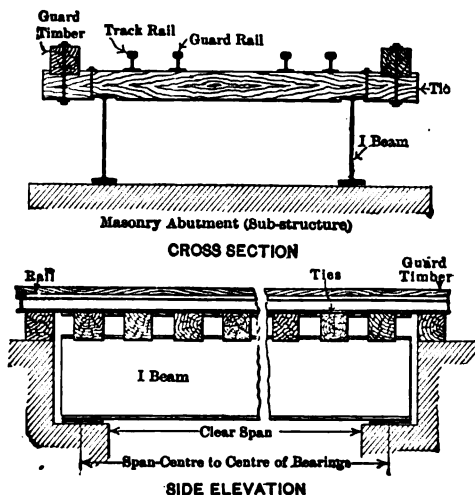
I-Beam Bridge for Single Track Railroad.
